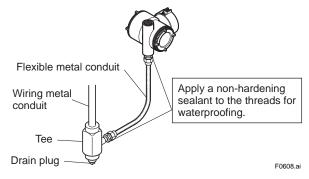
Typical Wiring Using Flexible Metal Conduit
